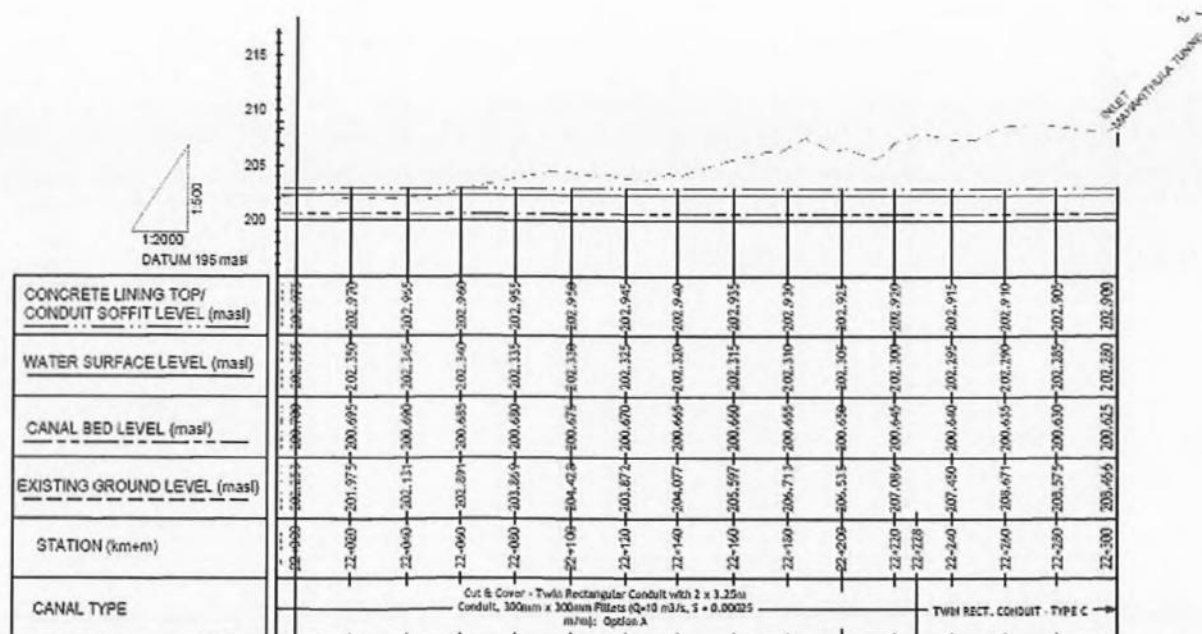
Longitudinal profile of the previous canal section with exposed conduit sections above ground
